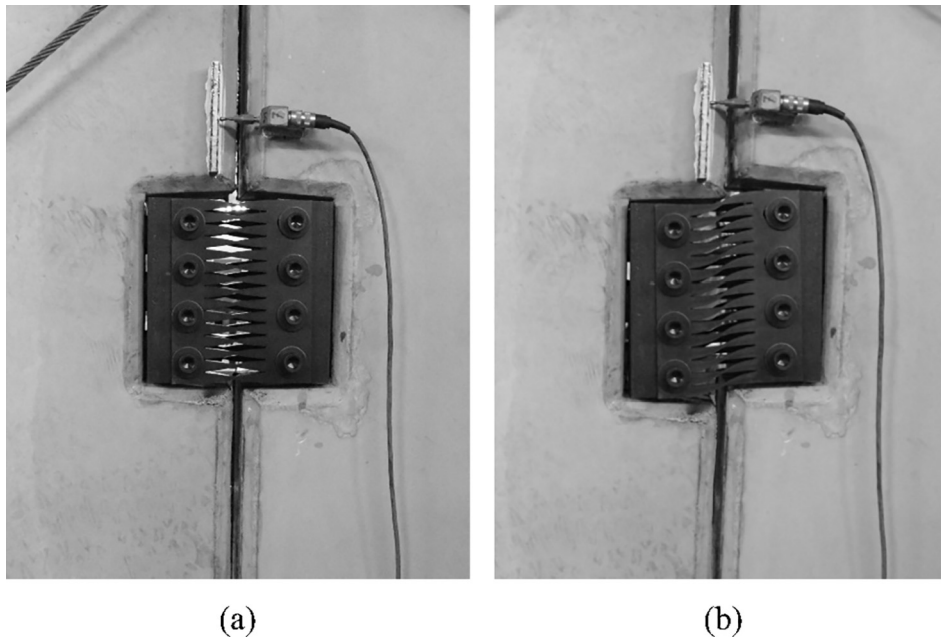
Detail of the MSD with hourglass-shaped beams and horizontal slots (IV) installed in between the panels on the structural sub-assembly: (a) undeformed and (b) deformed configurations.
